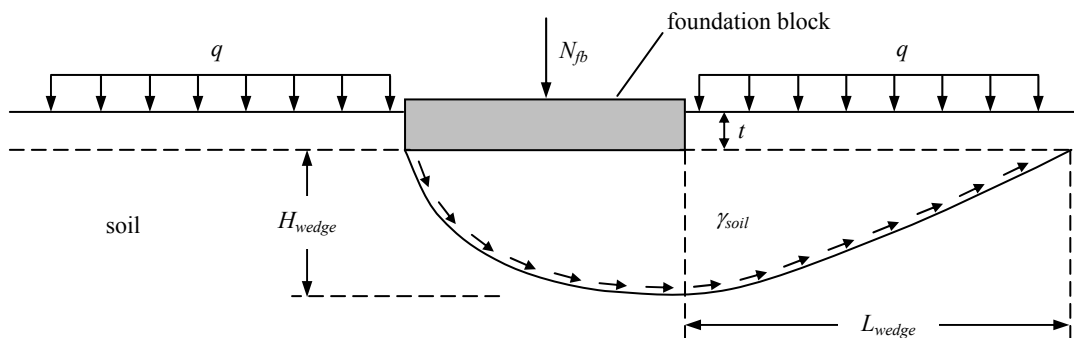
Failure mechanism of a rigid foundation block on a soil half-space under centric vertical load
